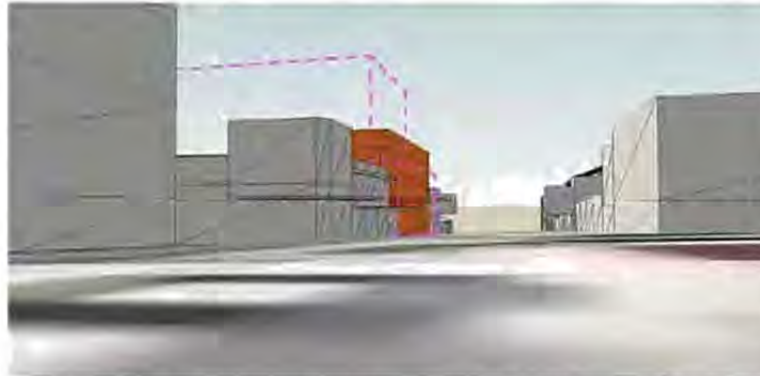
existing built form with proposed building envelope comparison (Norton Street looking north).
